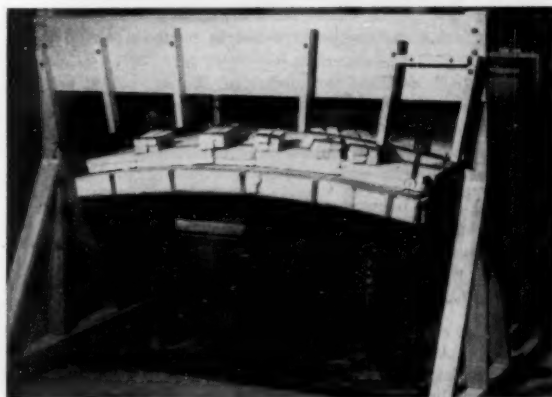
SPECIMEN AND TEST EQUIPMENT
